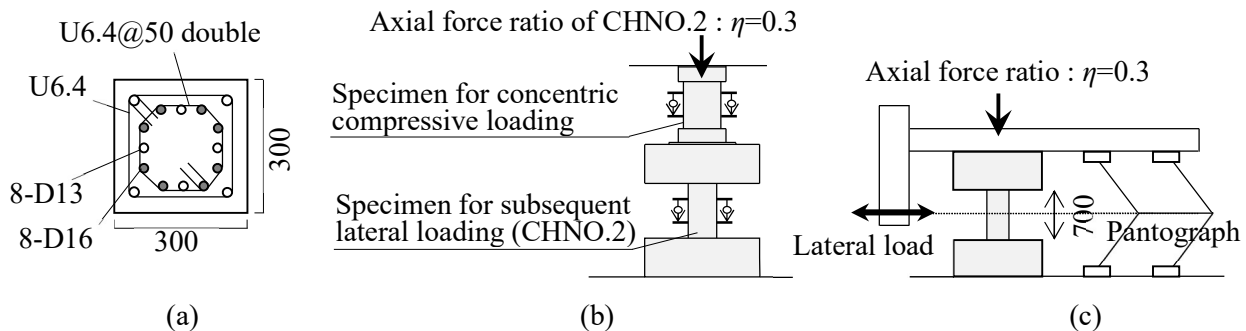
(a) is detail of cross section of specimen (mm), (b) is long-term axial loading test, (c) is short-term cyclic loading test (mm).
